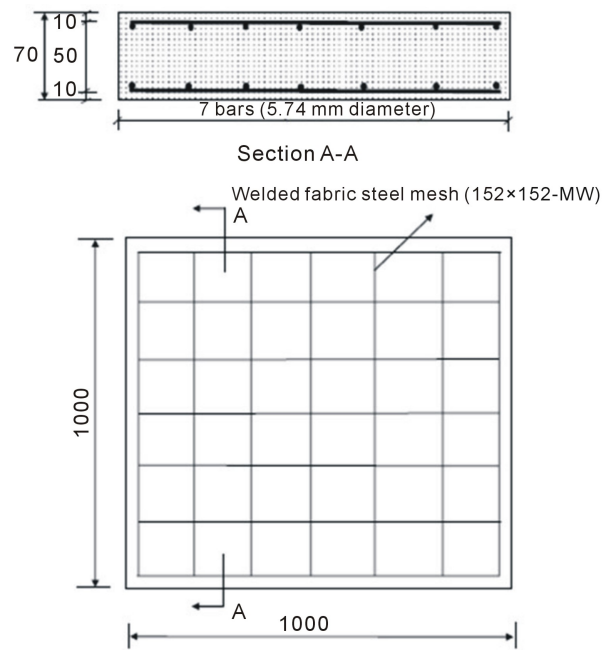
Test specimen geometry and reinforcement details (All dimensions in mm).
